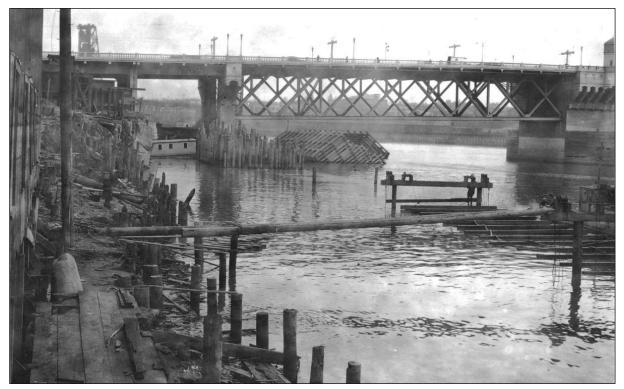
Stockpiling of dredged Harbor Wall fill immediately above the Burnside Bridge. Photo dated April 26, 1928.
